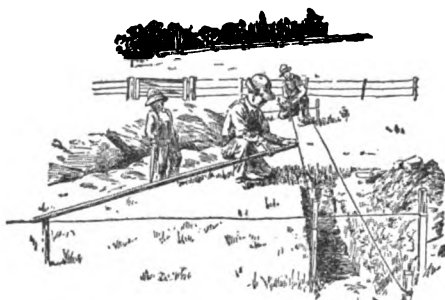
The practical application of Fig. 334 in building a barn foundation
